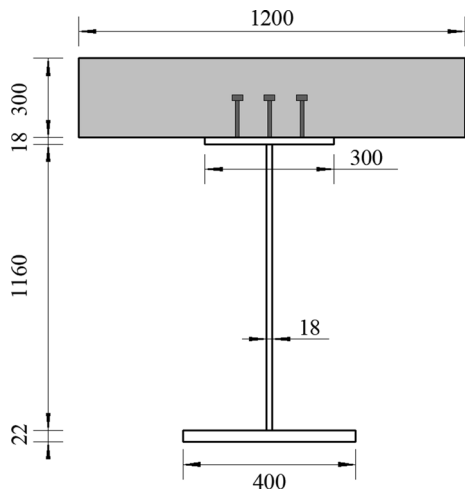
Section dimensions of calculated composite girder (unit: mm)
